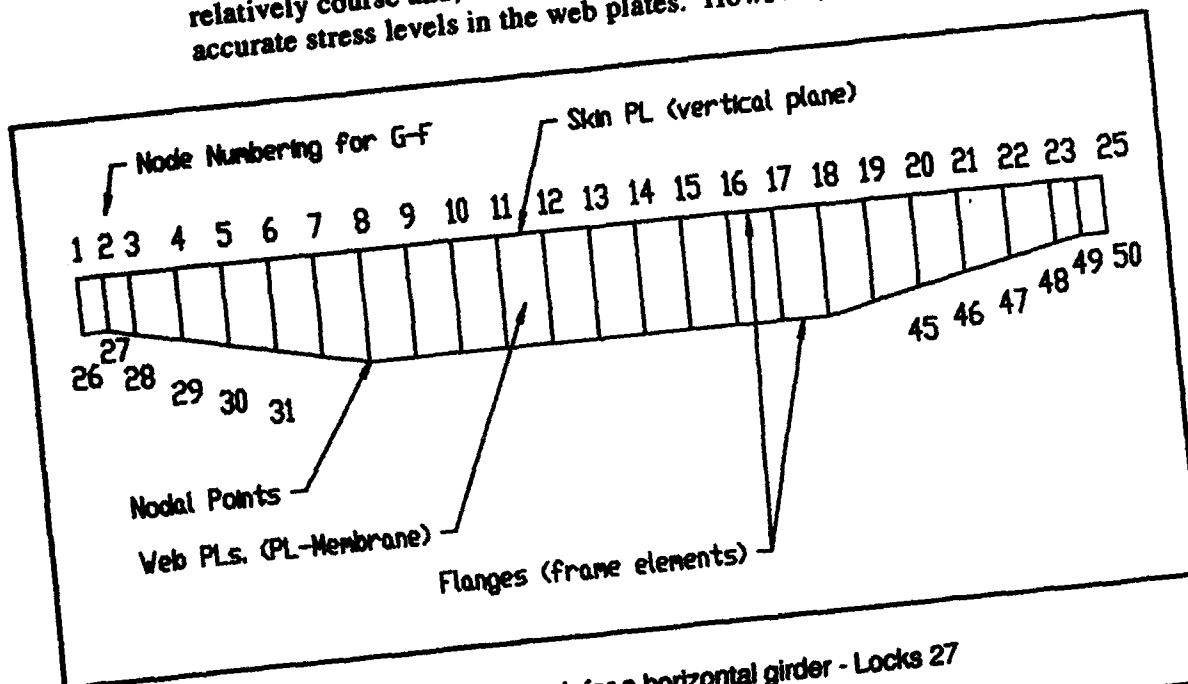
Plan view of finite element mesh for a horizontal girder - Locks 27
